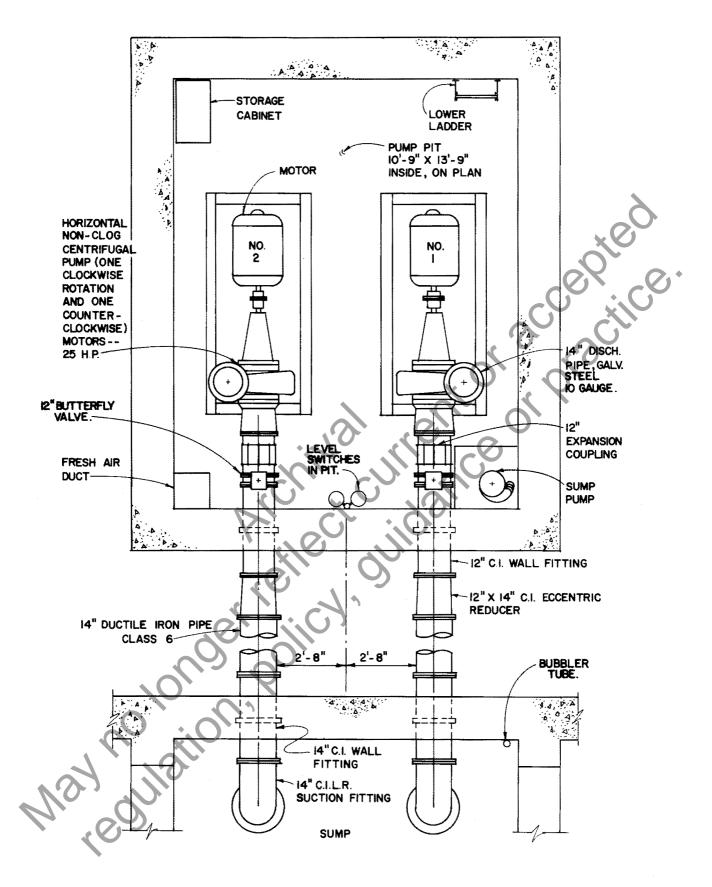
PLAN AT BOTTOM OF PUMP PIT
